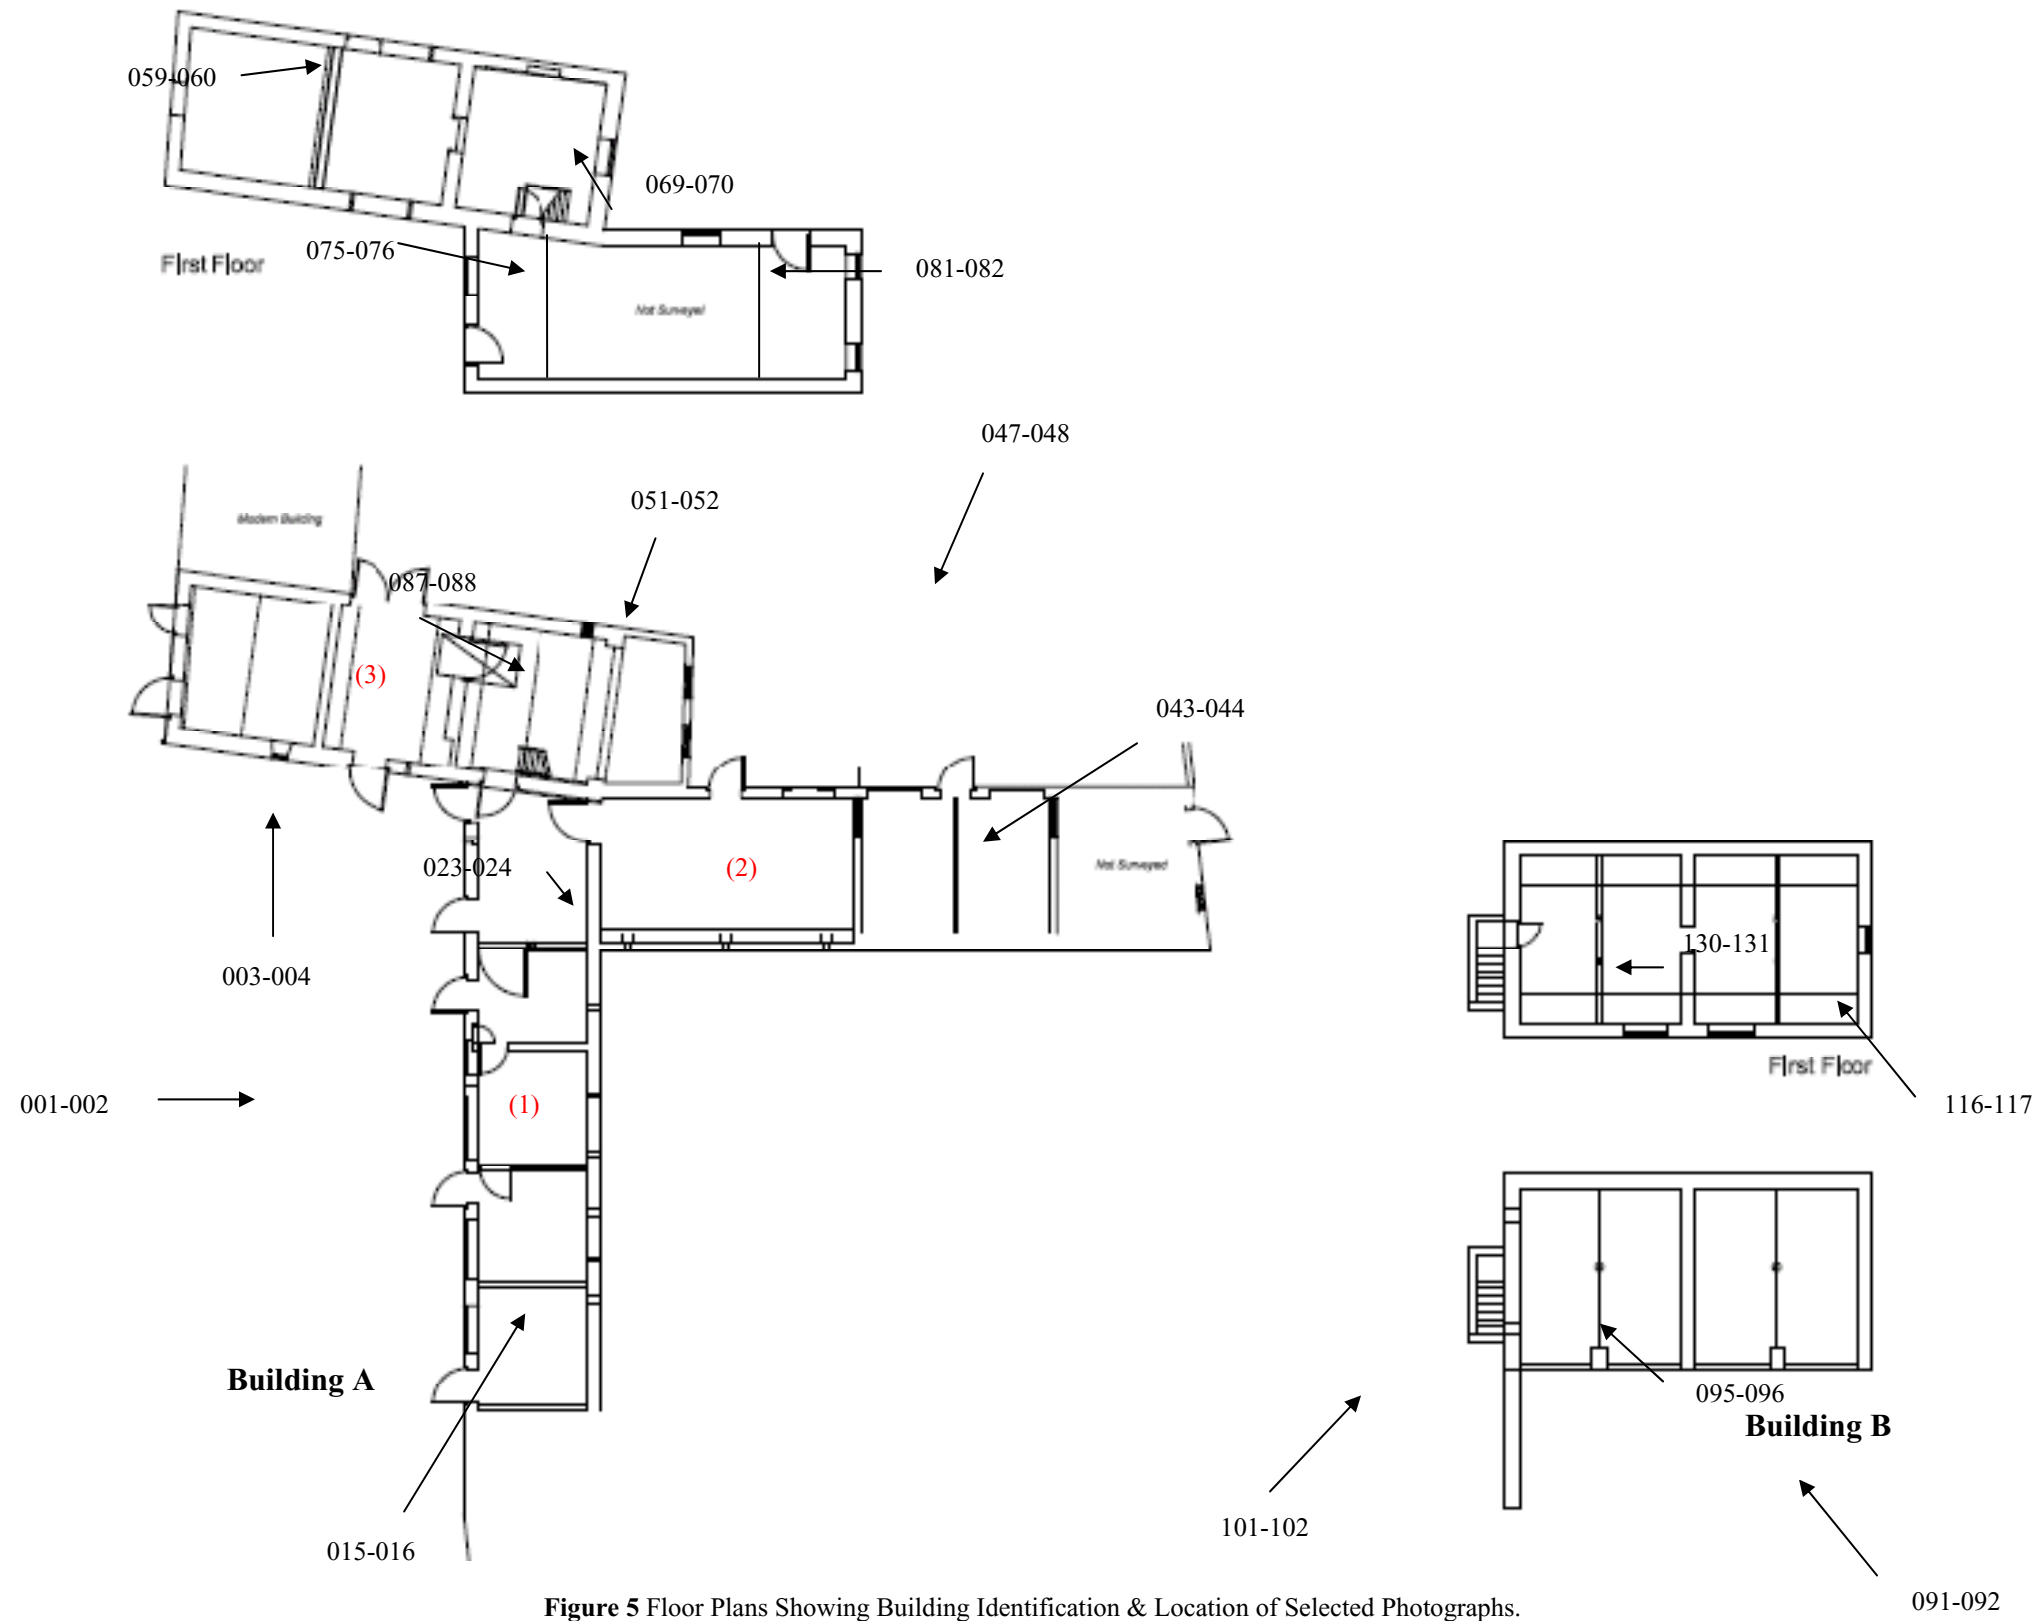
Floor Plans Showing Building Identification & Location of Selected Photographs.
